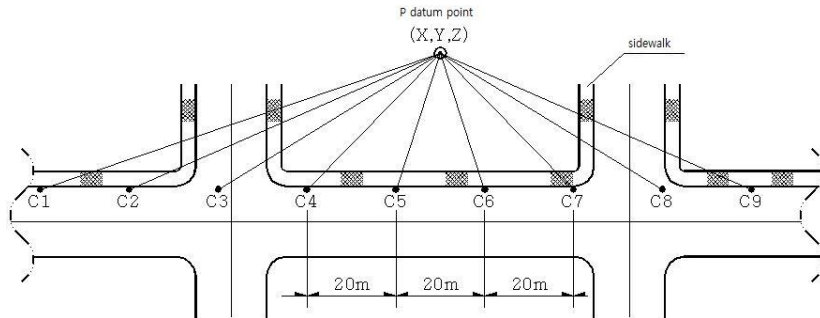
Floor plan – absolute coordinate measurement of C point using P point
